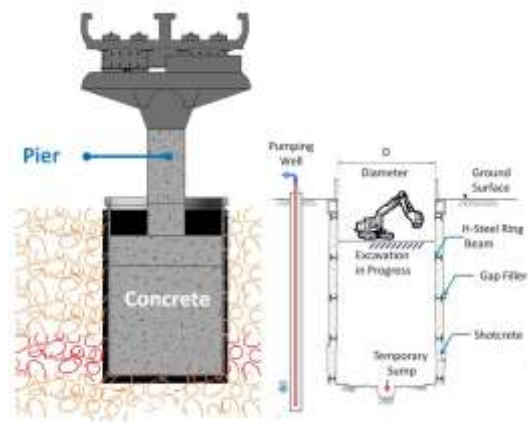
Caissons for piers supporting superstructures, Sanyin Line
